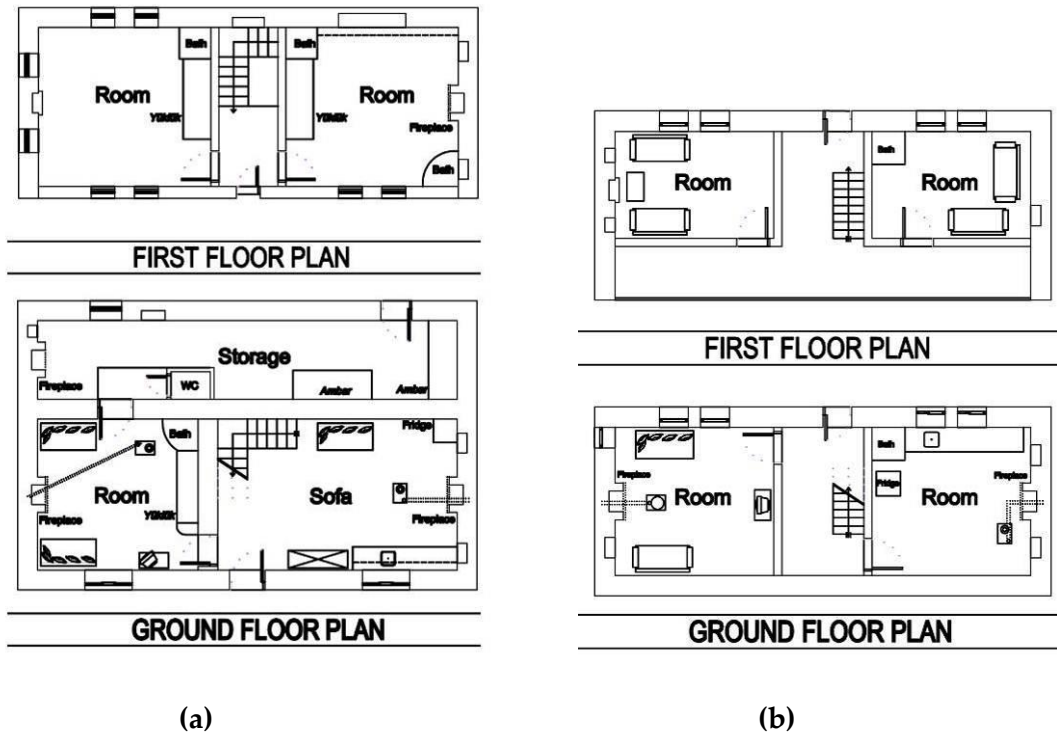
Rare plan types in the study area a) Plan of Fadime Avcı House, b) Plan of Avni Abak House
